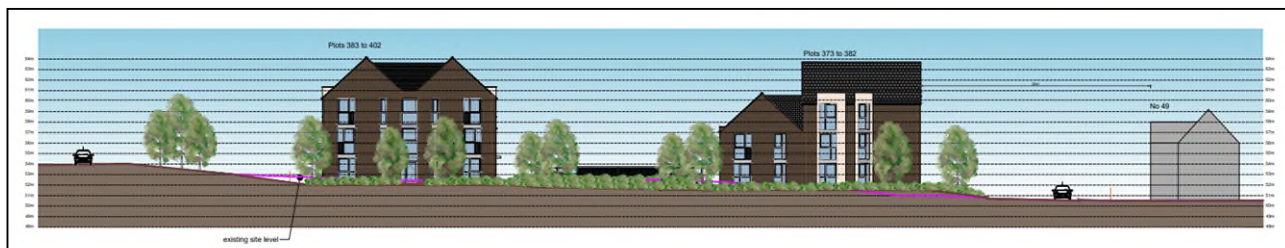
Cross Section showing relationship between Plots 373-382 and 49 Maesteg Road
